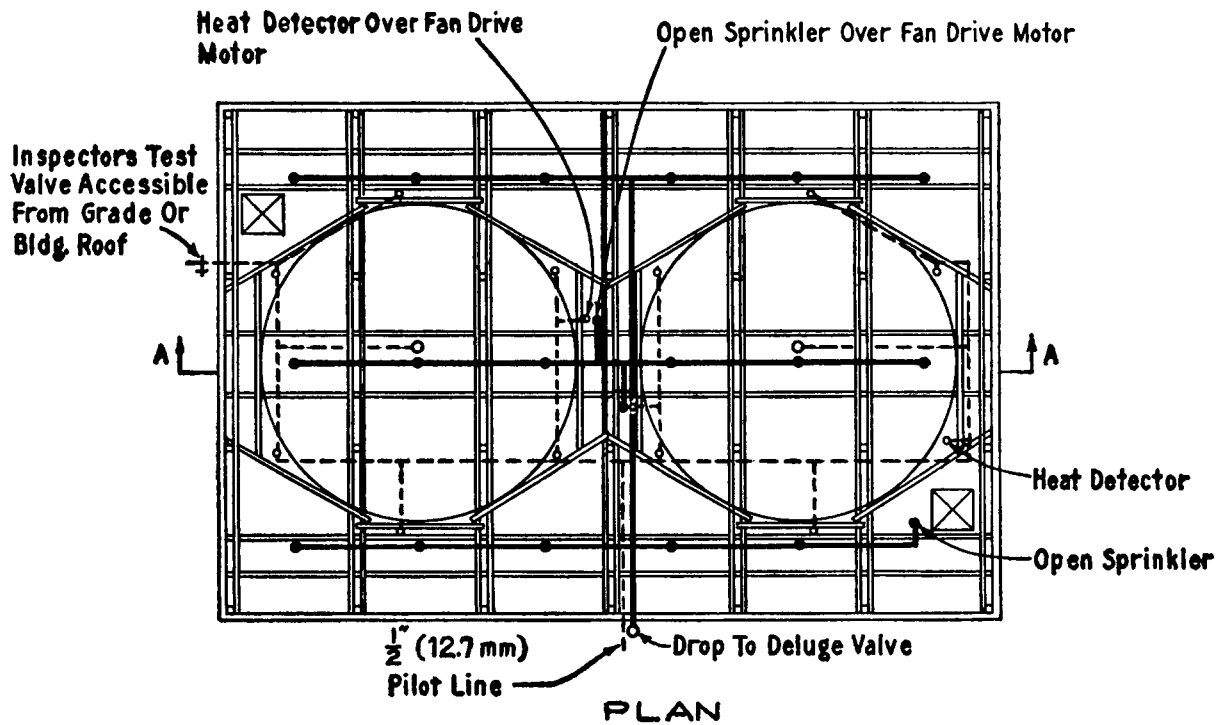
Typical deluge fire protection arrangement for counterflow towers.
